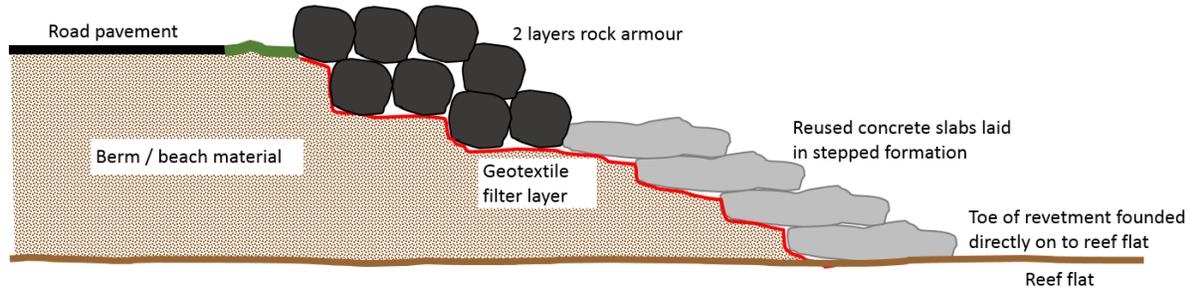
Cross-section of the proposed reconstructed revetment at Mosral
